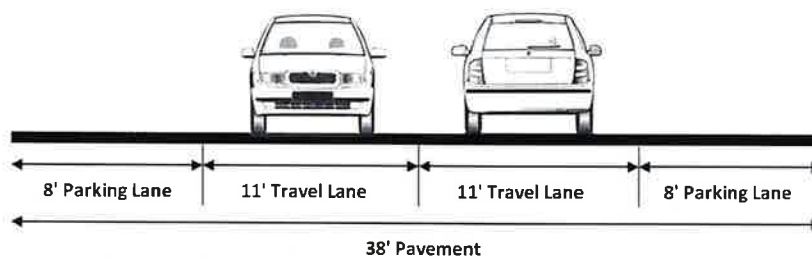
shows the cross section view on Main Street before improvement. Figure 4-4 shows the improved cross section with enhanced safety features for pedestrians and motorists, as well as aesthetics for neighborhood. Shark teeth before the crosswalk are introduced as well as "bump outs" on both sides of the street. Parking spaces are clearly marked to avoid any confusion and allow for efficient use of the parking lanes. A bike rack on the north side of Main Street is shown to be a part of the "bump out" which will provide a place for bicyclists to store their bikes.
